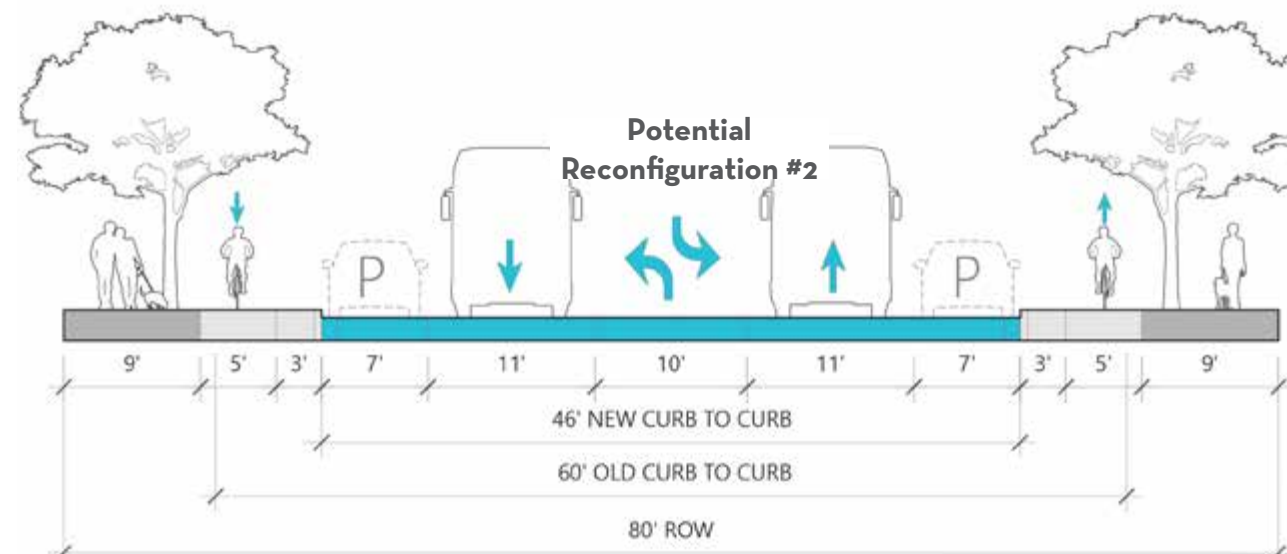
Potential Reconfiguration #2: One-Way, Sidewalk-Level, Class IV Bikeway on a Downtown Collector Street.
